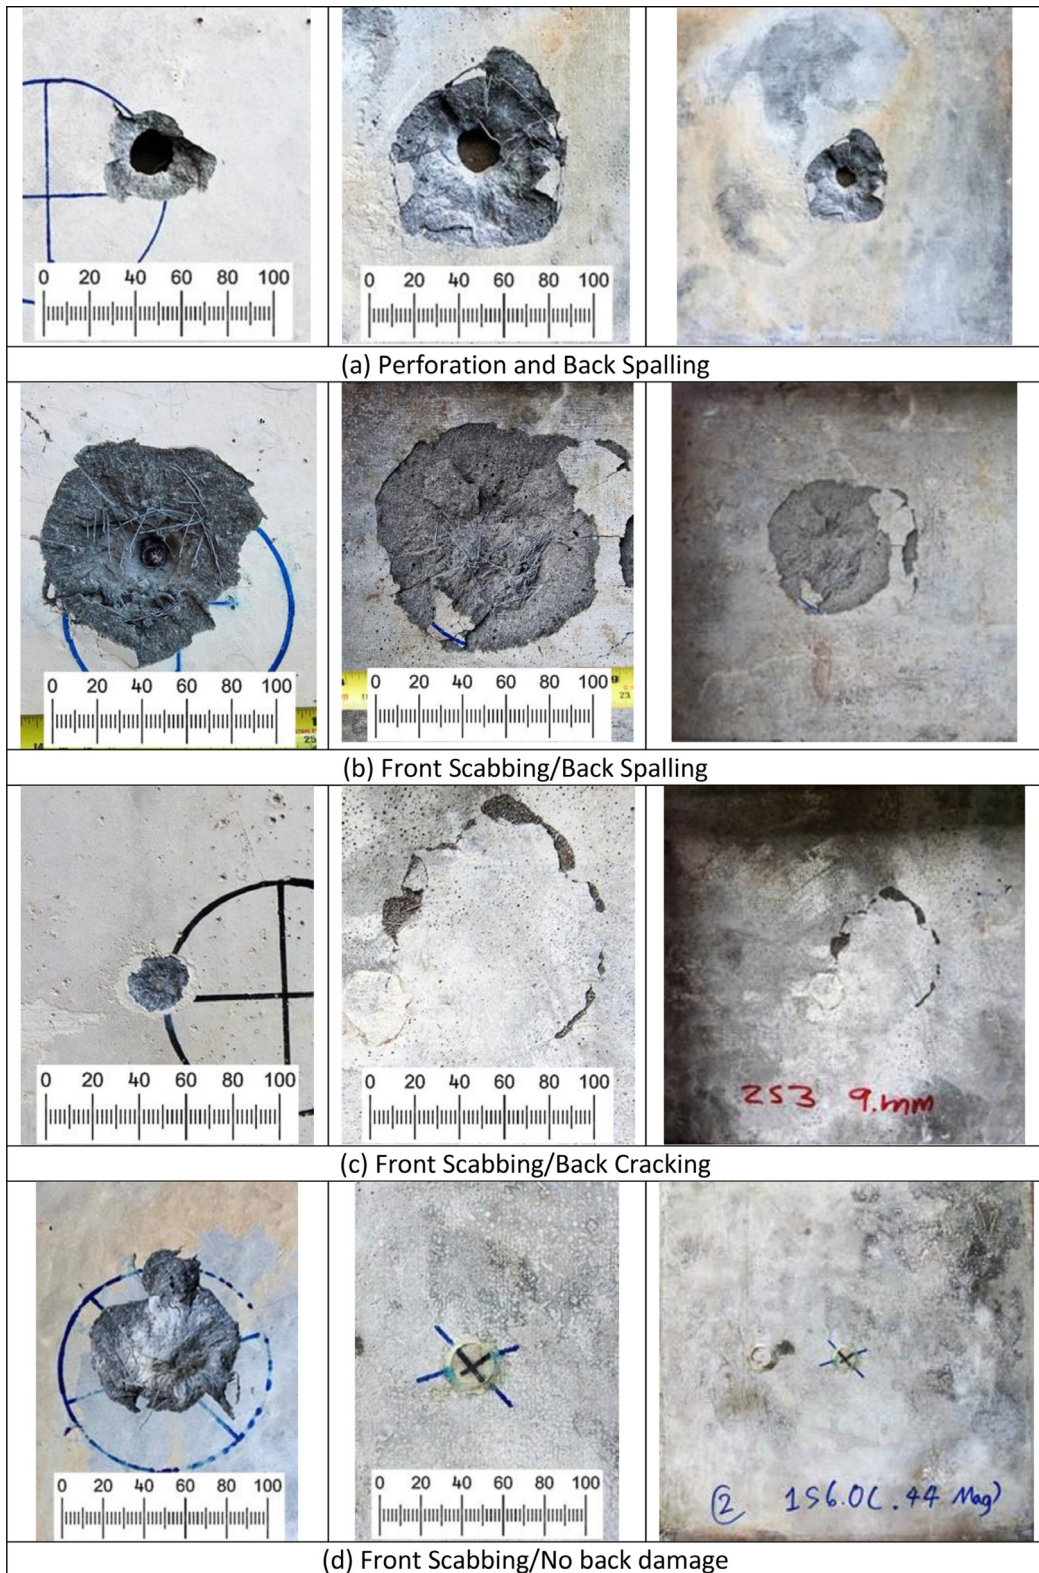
Typical Failure Patterns of a Single Straight Shot (a) Perforation, (b) Front scabbing + Back spalling, (c) Front scabbing + Back cracking and (d) Front scabbing only.
